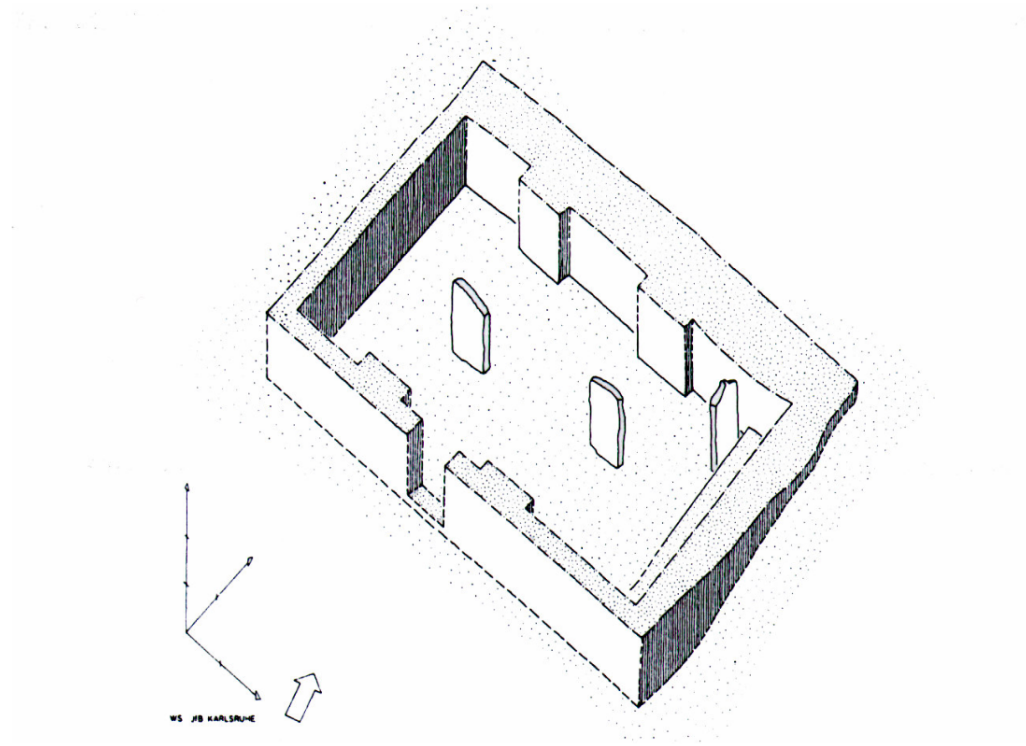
Çayönü. Isometric reconstruction of Flagstone Building. (Schirmer, 1983, p. 475).
